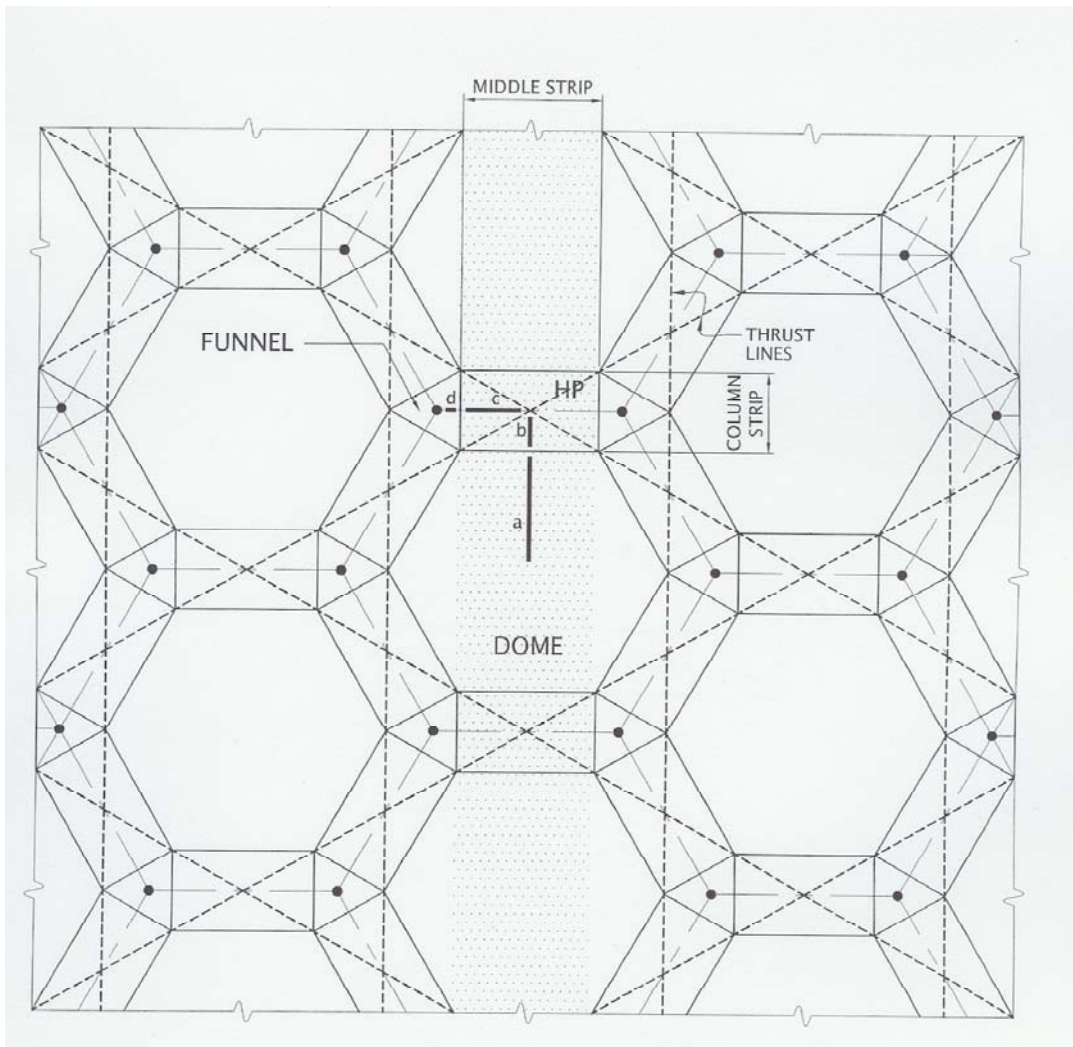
Structural Membrane configuration developing a hexagonal column plan.
